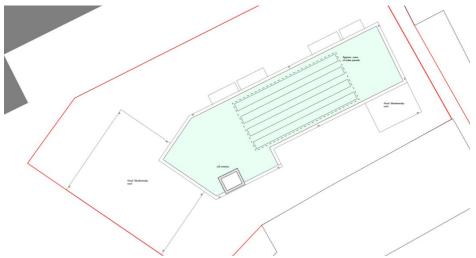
Roof plan showing biodiversity roofs and position of solar photovoltaics.
